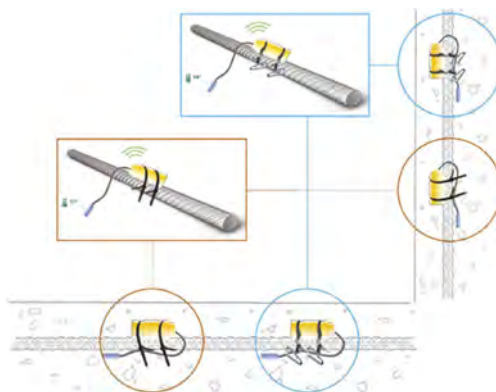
Example of mounting and fixing the concrete maturity sensor on horizontal and vertical reinforcement.
